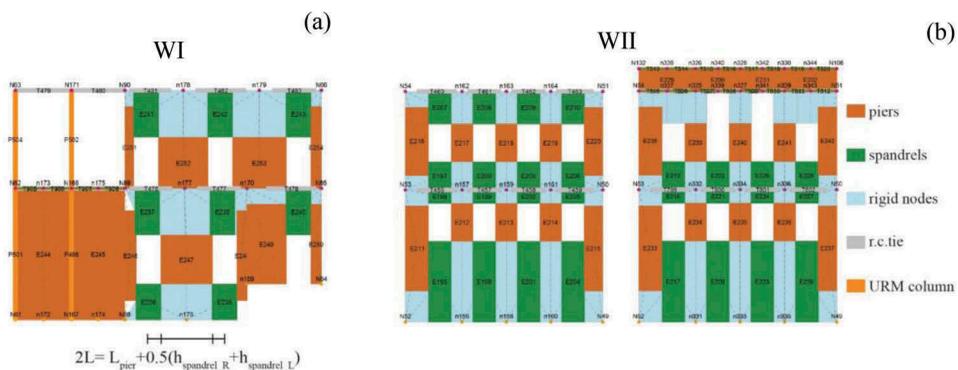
Equivalent frame idealization of some walls: piers with different foundation level (a); different strategies to model the masonry portions in the attic level (as equivalent mass b1 or explicitly b2) (b).
